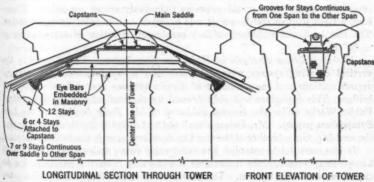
ARRANGEMENT OF OVERFLOOR STAYS AT THE TOWER TOPS
